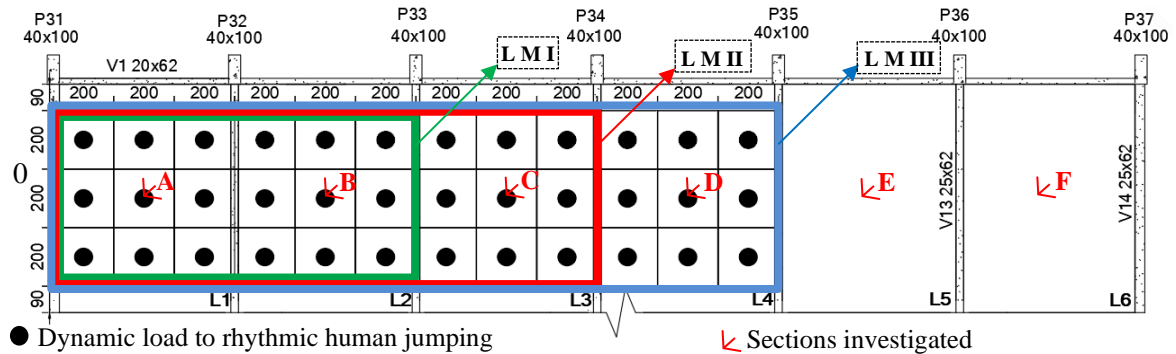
Dynamic loads on the reinforced concrete floor (units in centimetres)
